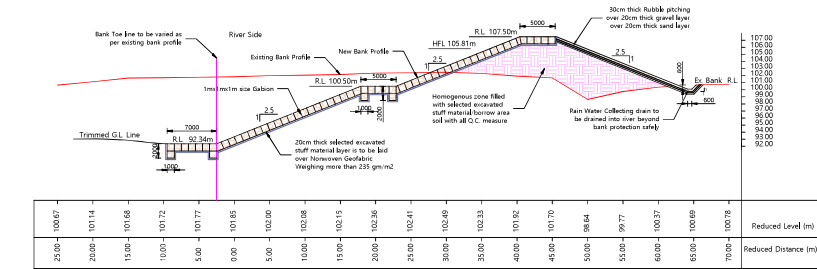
(C) TYPICAL CROSS SECTION OF HIRAPURA BARRAGE GUIDE BANK - U/S RHS @ CH. 360 m
